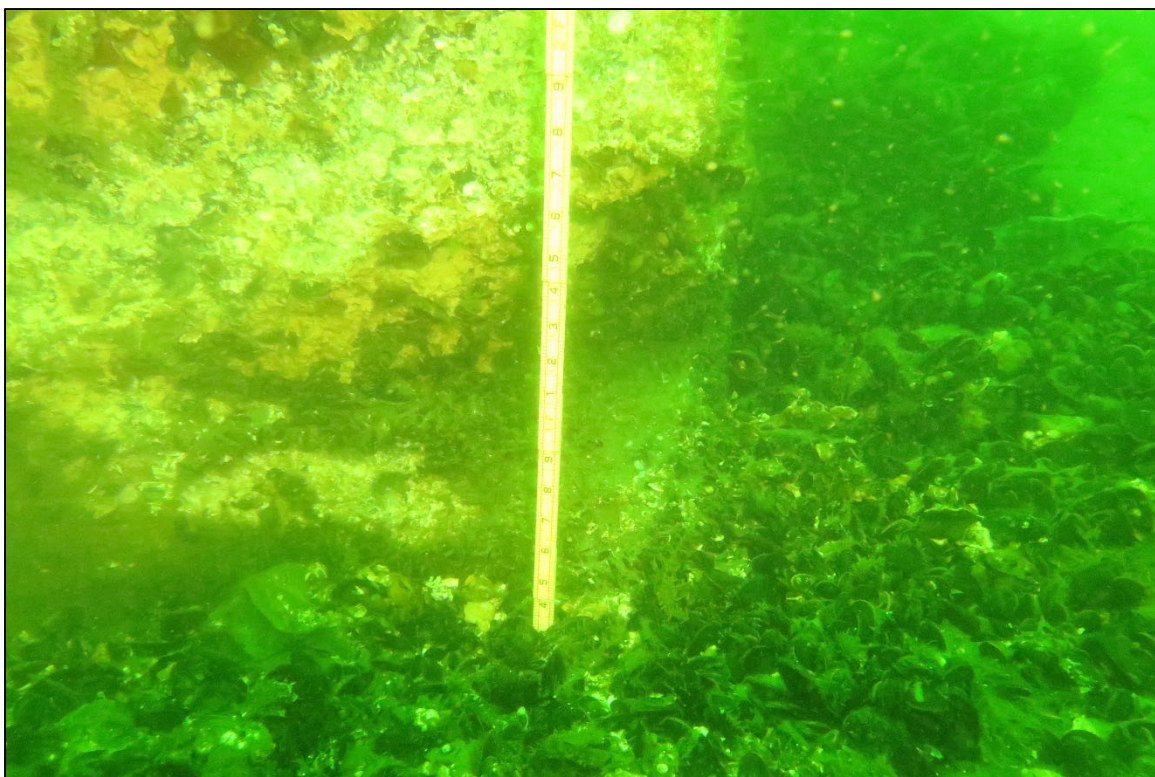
Spall at Bottom of Cleanout Chamber at the Southeast Corner.
